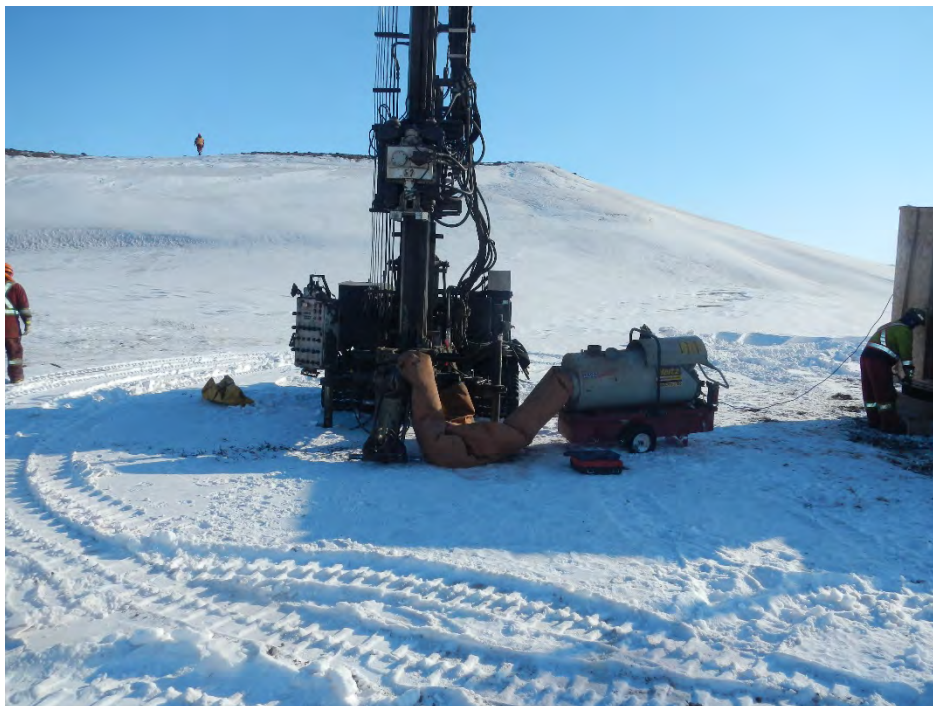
Drilling Conditions at BH18-BR102-1, April 2018
